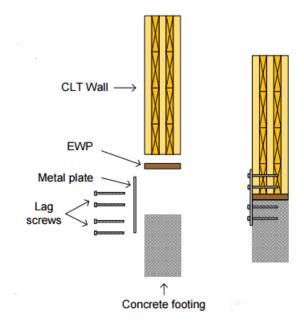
Wall to concrete connection using metal plate and lag screws. (Adapted from Mohammad 2011)
